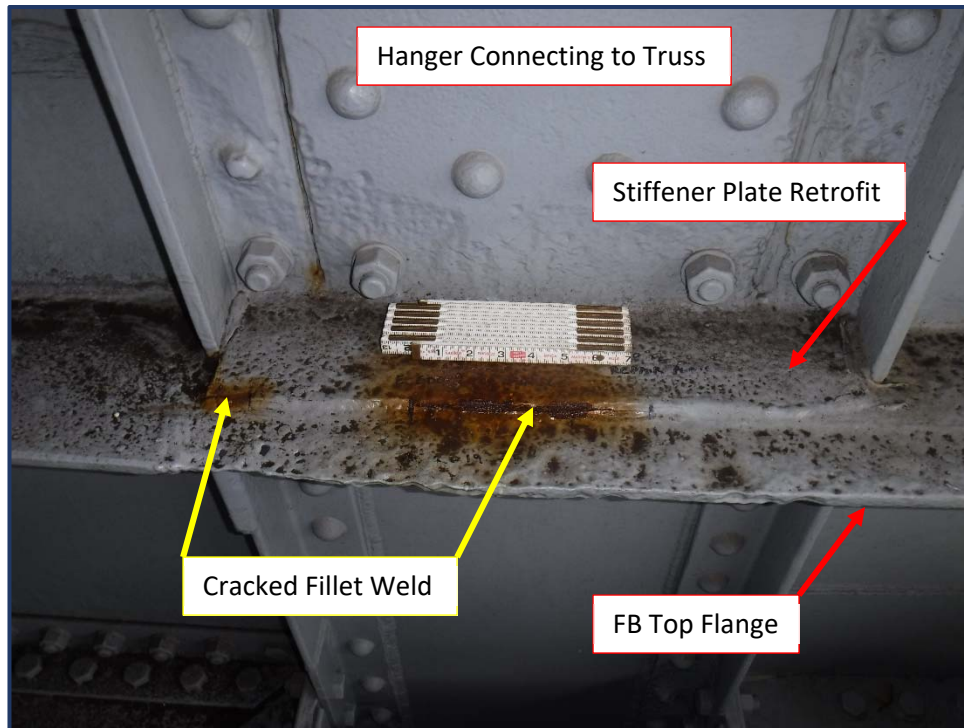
Cracking at Lower Deck Floorbeam Stiffener Plate Retrofit
